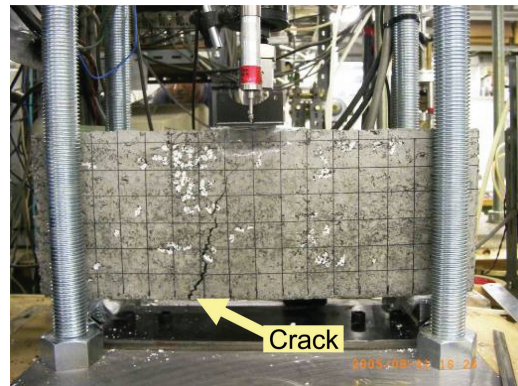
Failure of unreinforced beam model ($c/g = 4\%$).
